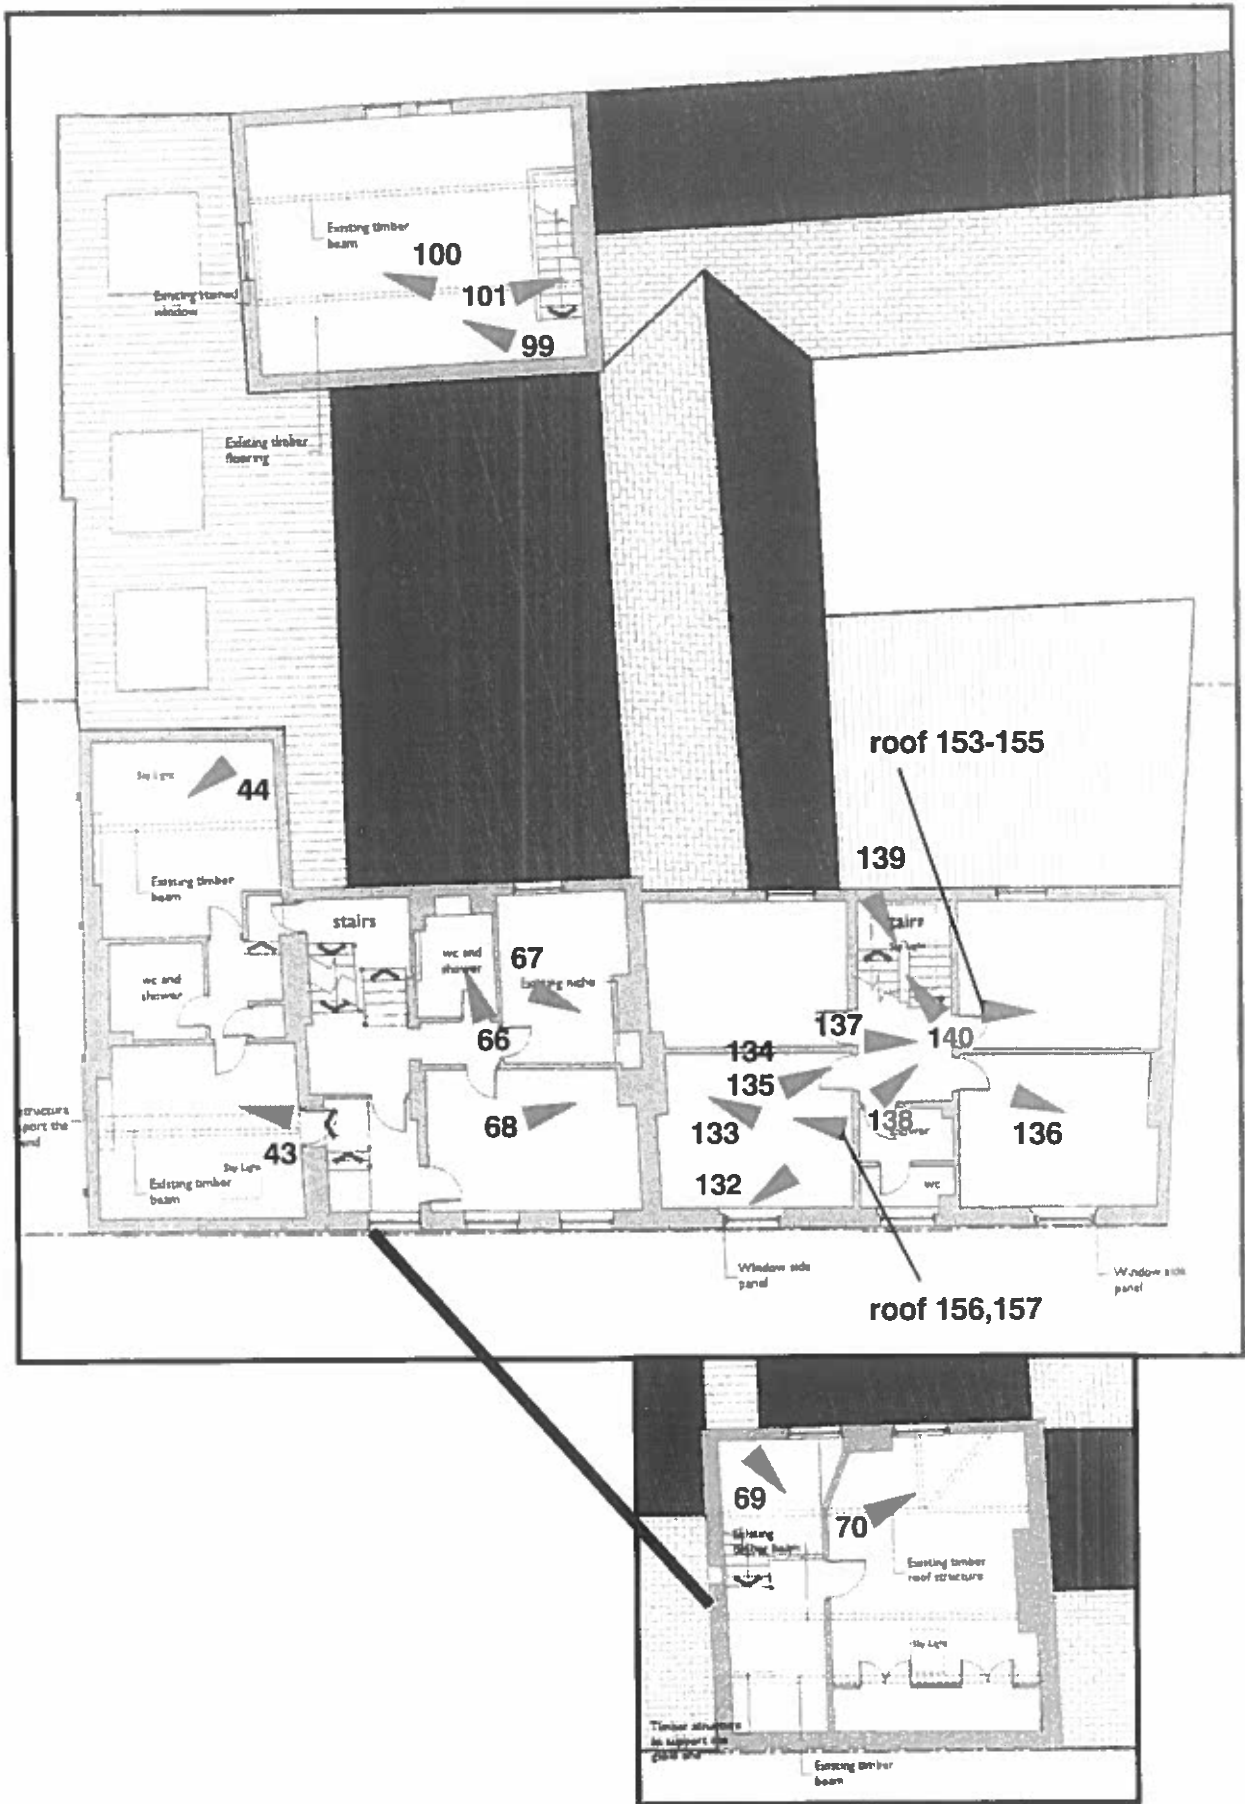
Viewpoints of archive photos of second and third floor rooms of 10-14 St Helen's Street, Derby and buildings to the rear. Not to scale. Copy courtesy of Franklin Ellis Architects.
